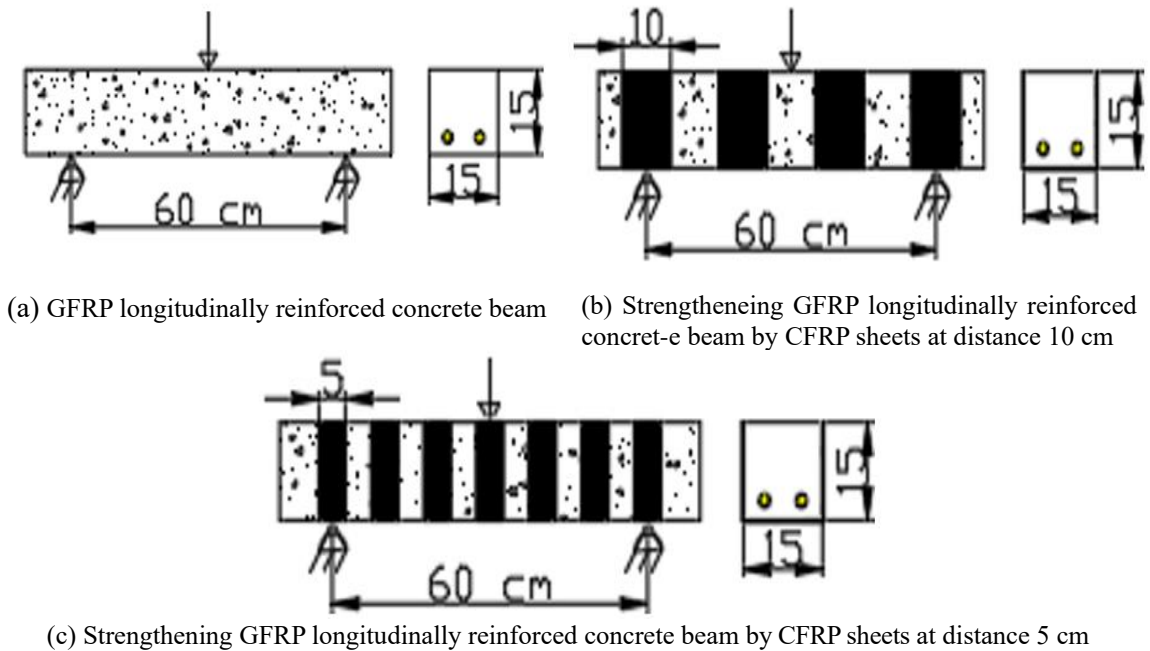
Strengthening reinforced concrete beams with longitudinally GFRP bars having cast-joint by CFRP sheets
